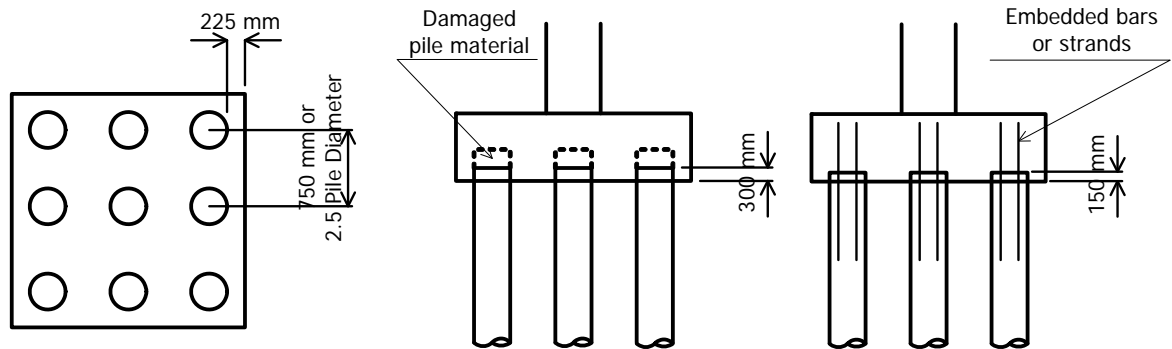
Minimum Pile Spacing, Clearances and Embedment of Pile Top to Footing
